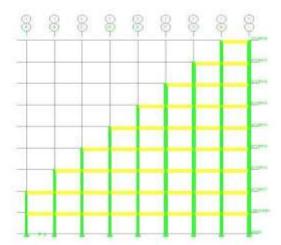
Elevation of setback building for eight storey model (00 slope)
